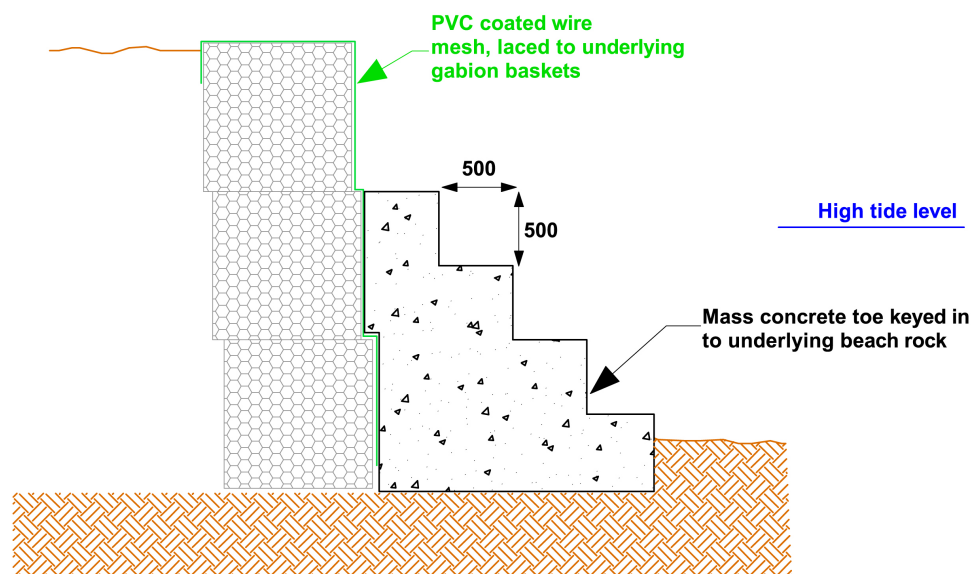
Repair and upgrade details to the section of gabion seawall fronting the Administration Building. Dimensions in mm.
